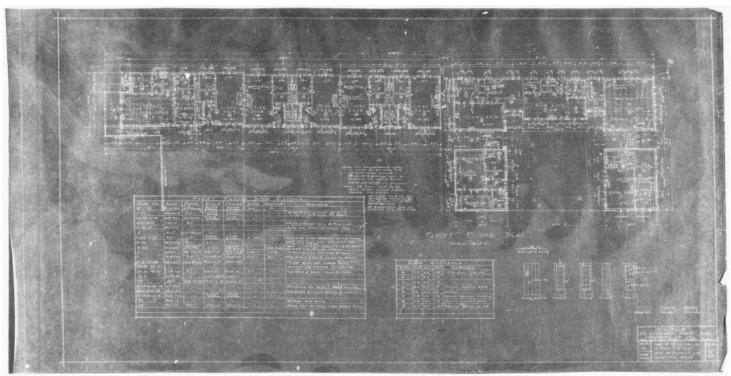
Beauville, First Floor Plan – 1928 (2 of 7)
